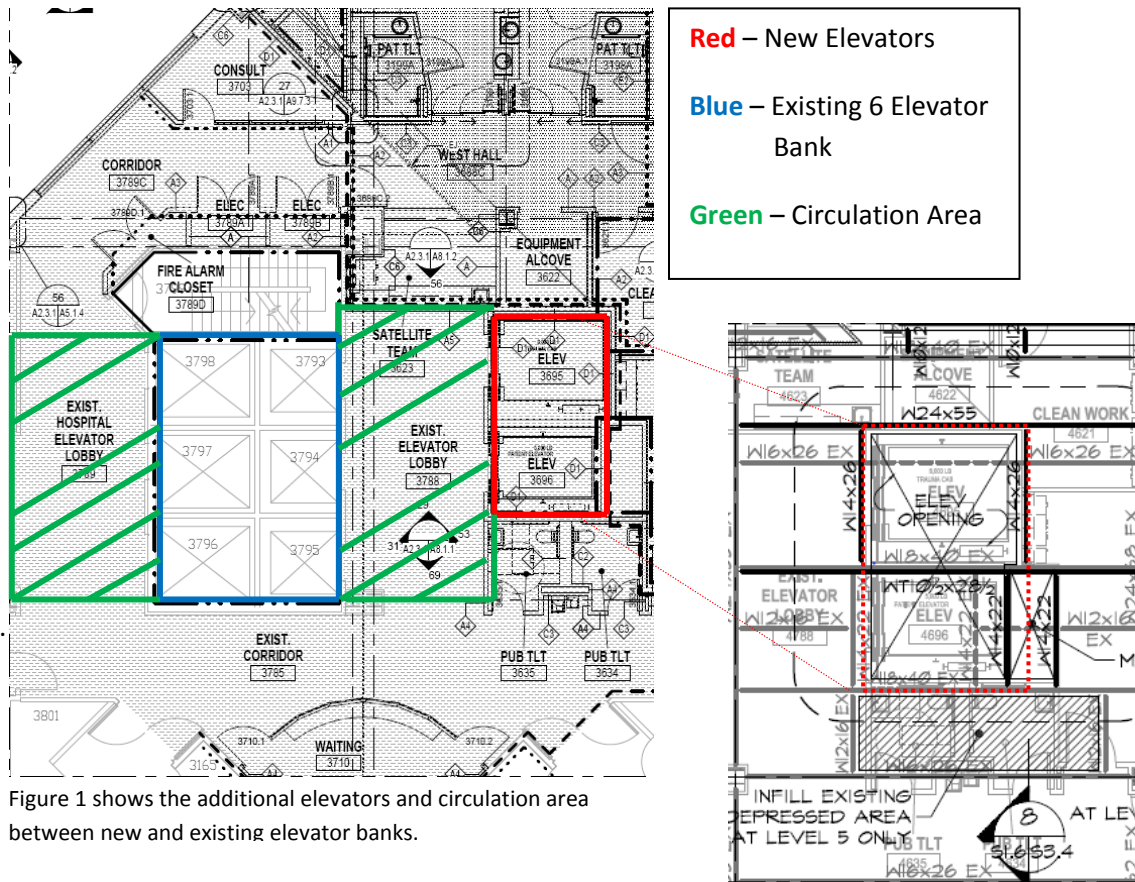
shows the additional elevators and circulation area between new and existing elevator banks.
